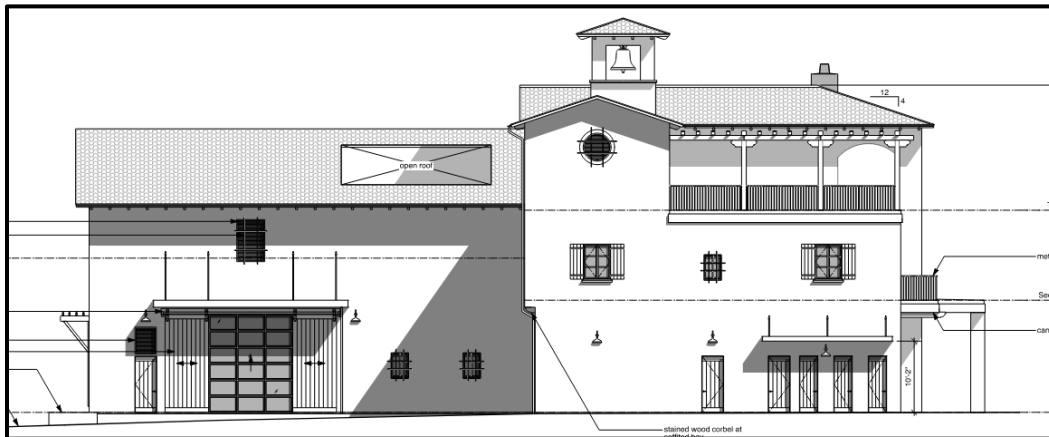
PG&E Elevation – Modified (Attachment E, Sheet A3.02)
